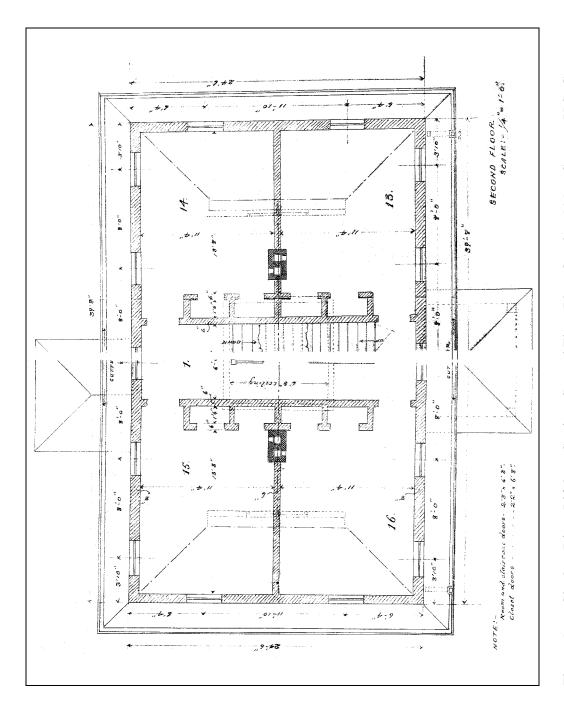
Siuslaw River Lifeboat Station, Second Floor Plan, October 1916. Source: U.S. Coast Guard Civil Engineering Unit, Oakland, CA.
